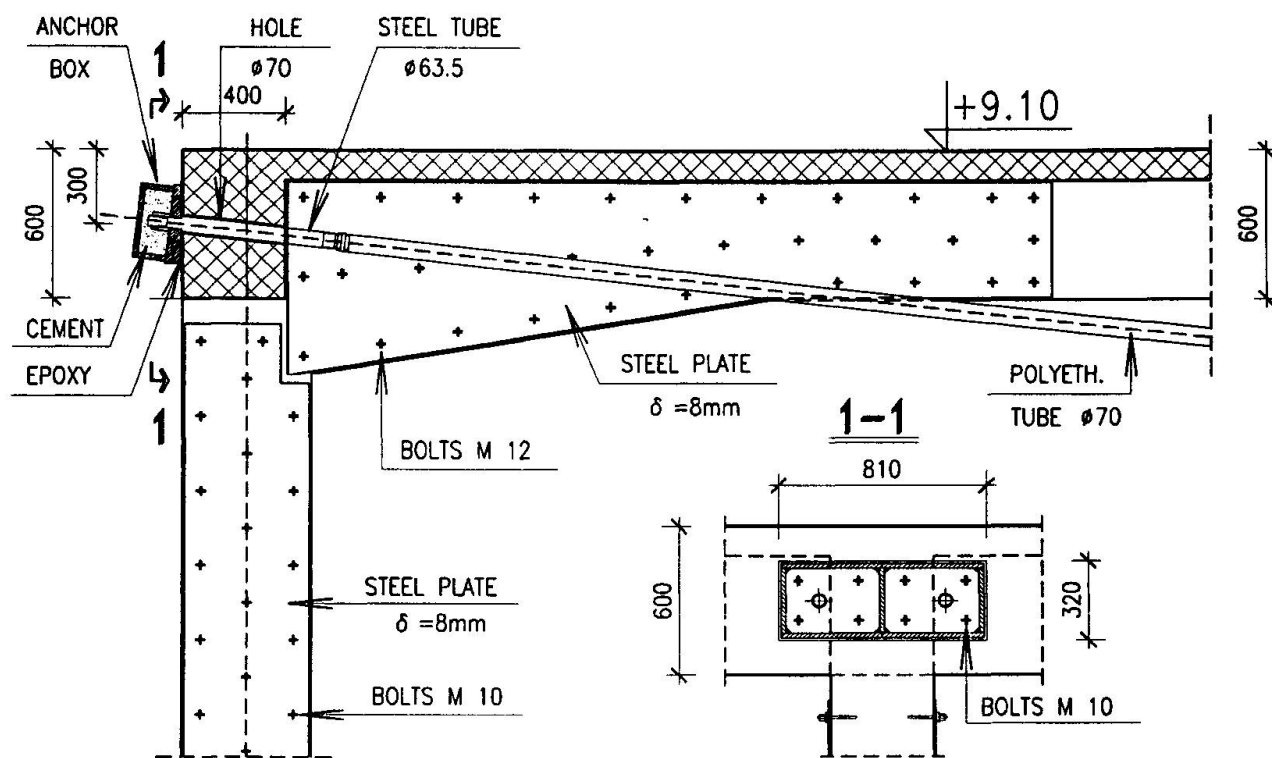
Detail 'C' of tendon anchoring and lateral strengthening with steel sheets
